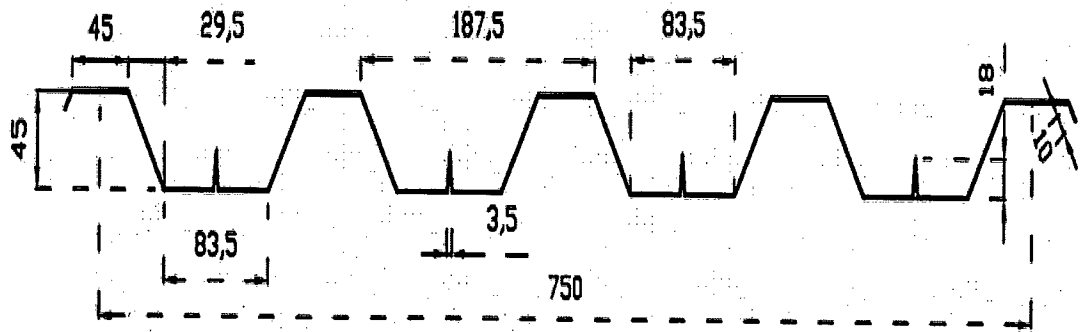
Cross-section of Profiled Steel Sheeting, PEVA45 in mm
